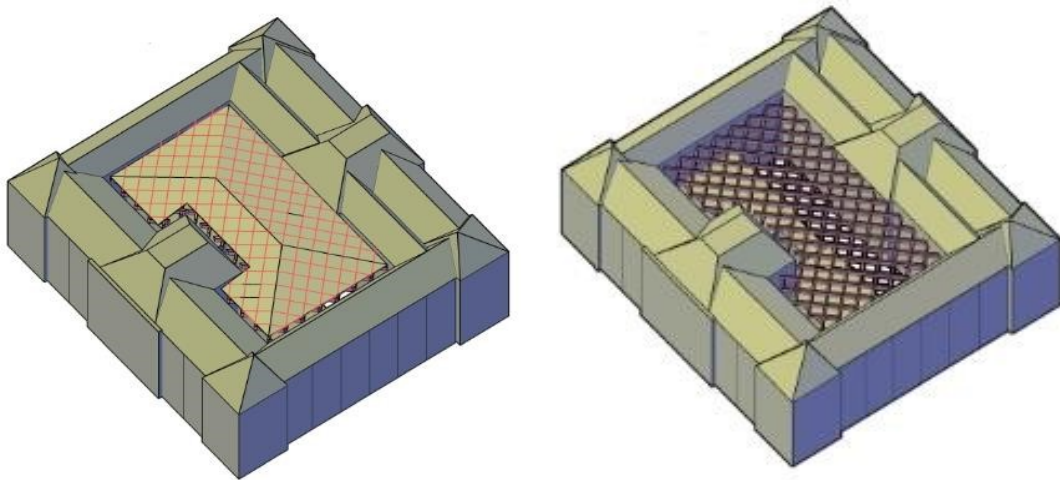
Atrium Roof Consist of Stainless-Steel Structure with Glass Skylight Frame 3D model
